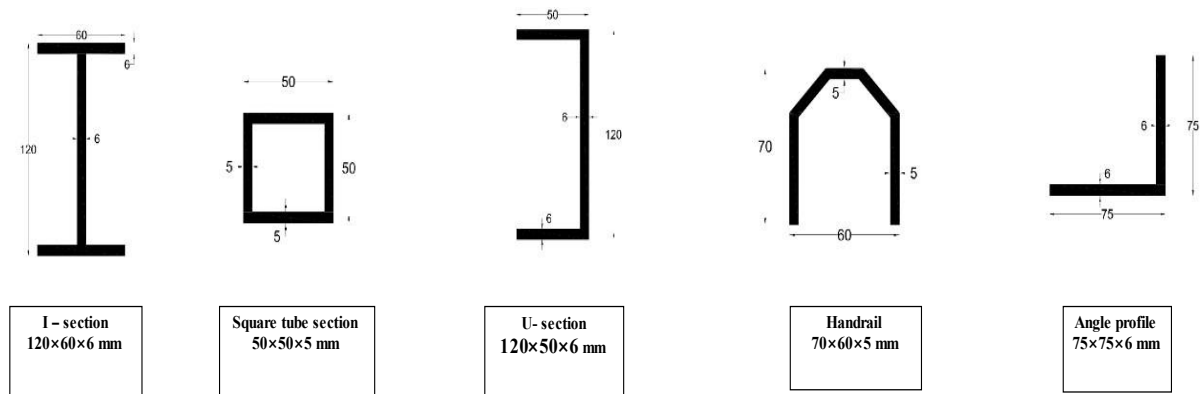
shows geometry and dimensions used for CFS pedestrian bridge [54].
